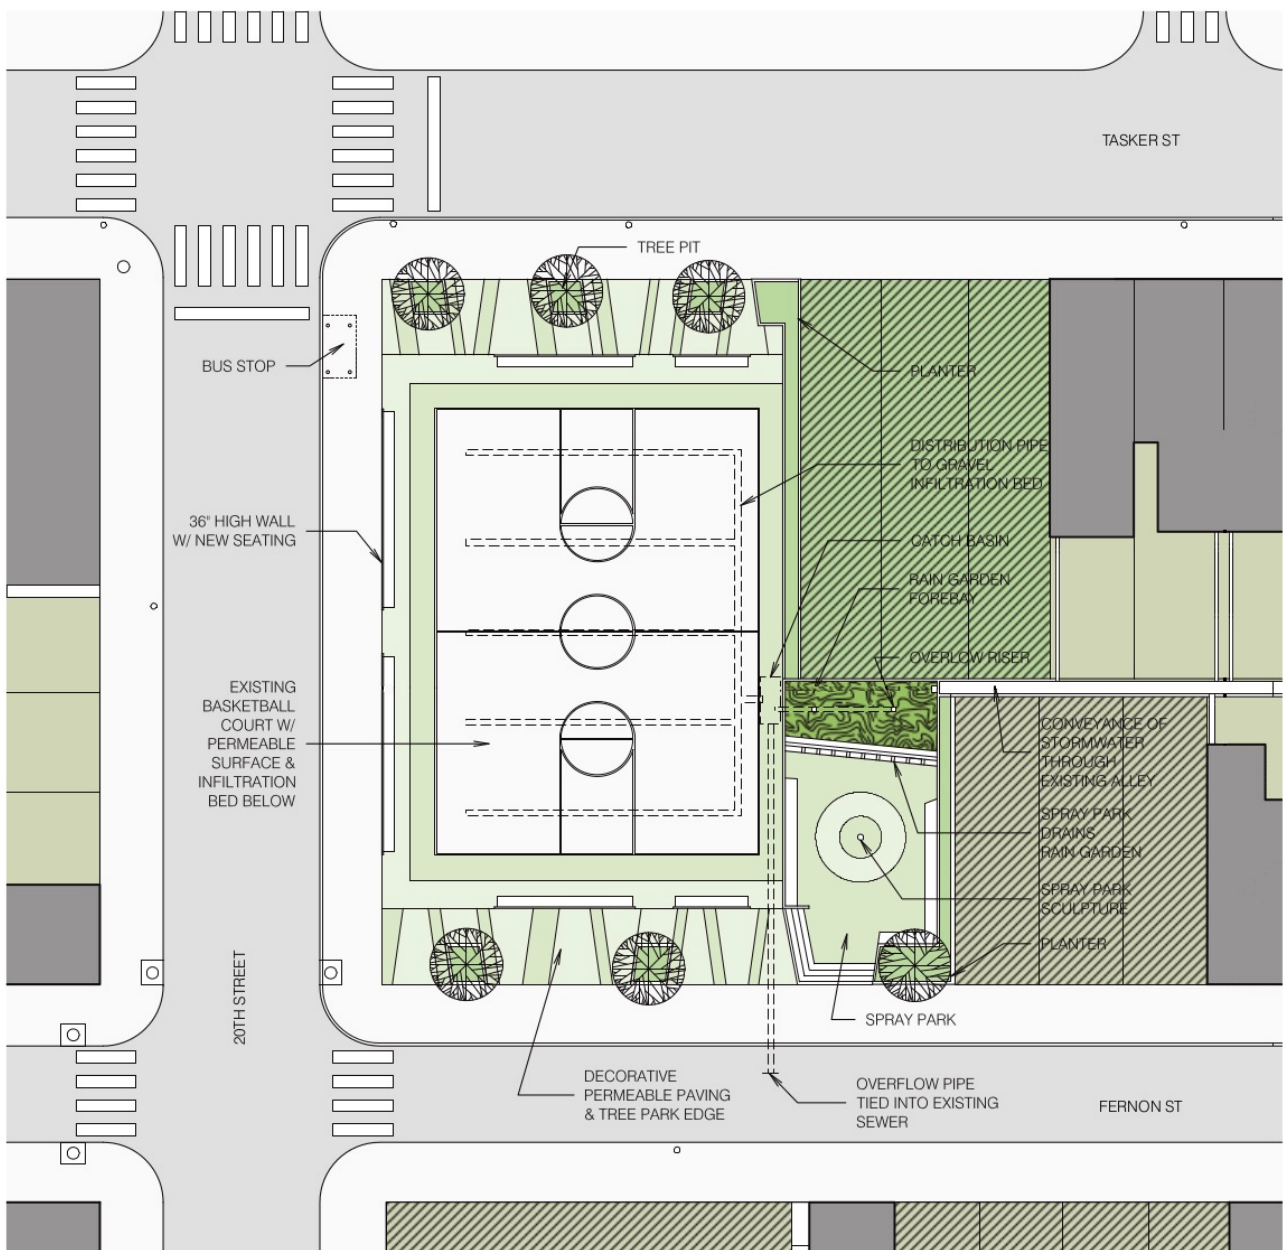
Model 2—Plan view of block-end parcel detail, including a central rain garden and permeable ball court.
